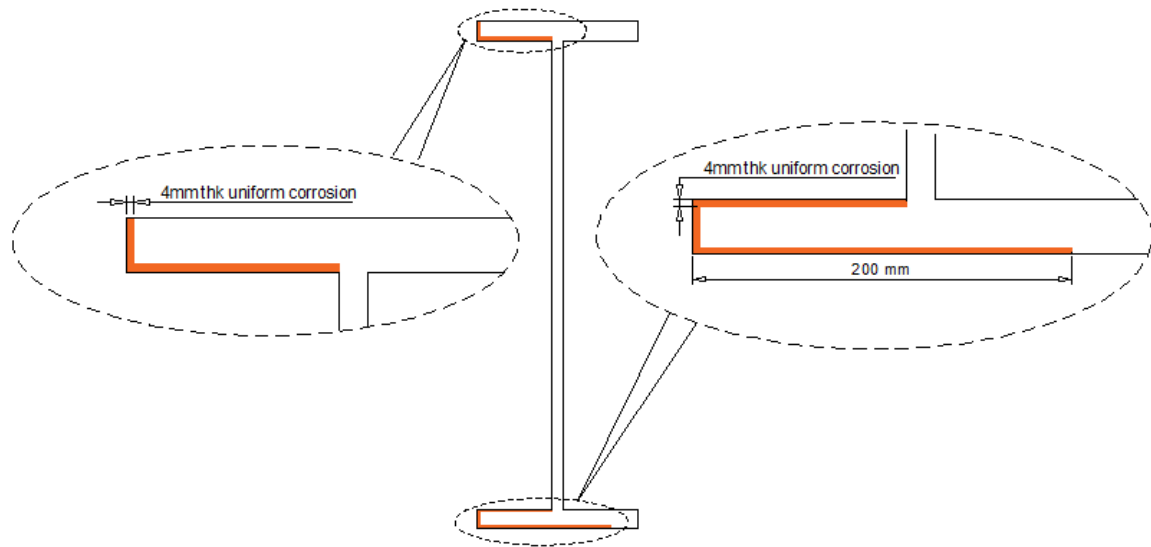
Corroded DIP 95 cross section at midspan of exterior girder with 4mm uniform corrosion at top and bottom flange bottom surface.
